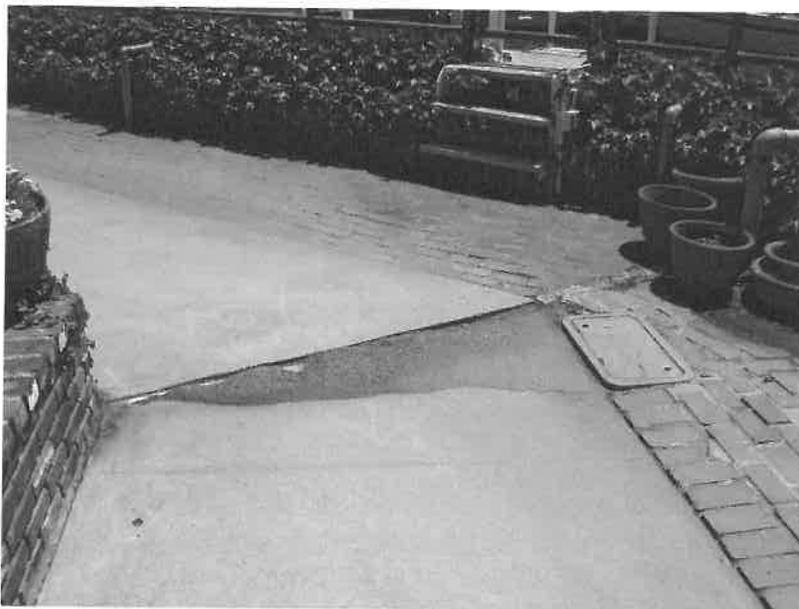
24, Naples, Top Deck Survey: Naples Canal, #5607
